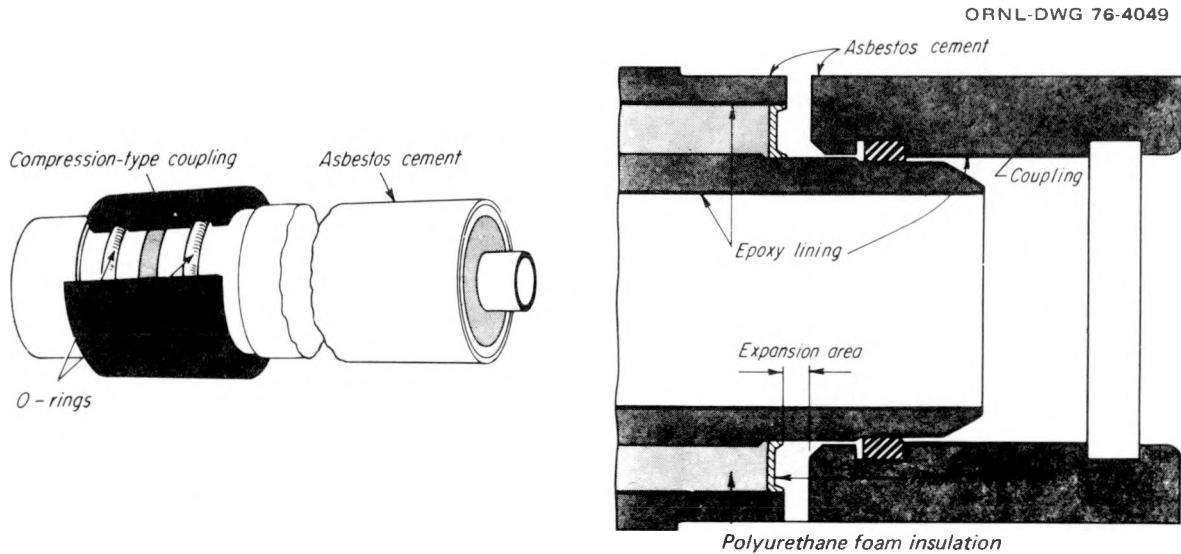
Asbestos-cement conduit coupling and joint section. (Casing and pipe are lined and urethane-foam insulated. Coupling is also expansion joint.) From S. Elonka, "Underground Piping Systems," *Power* 109(4): 217-224 (April 1965), with permission from McGraw-Hill.
